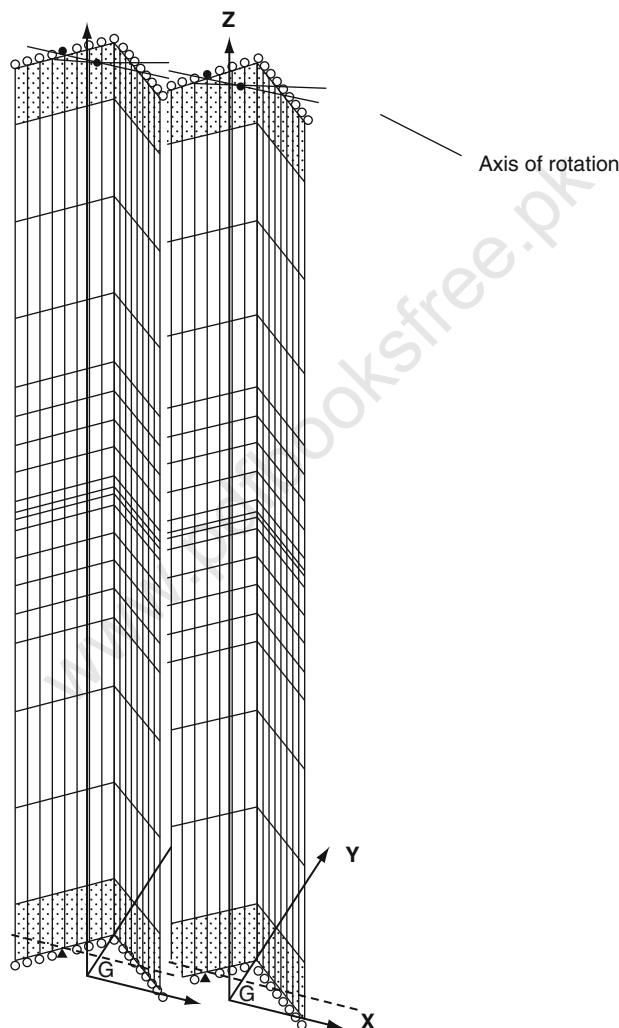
Building frame in three dimensions using global axes on sectional elevation
